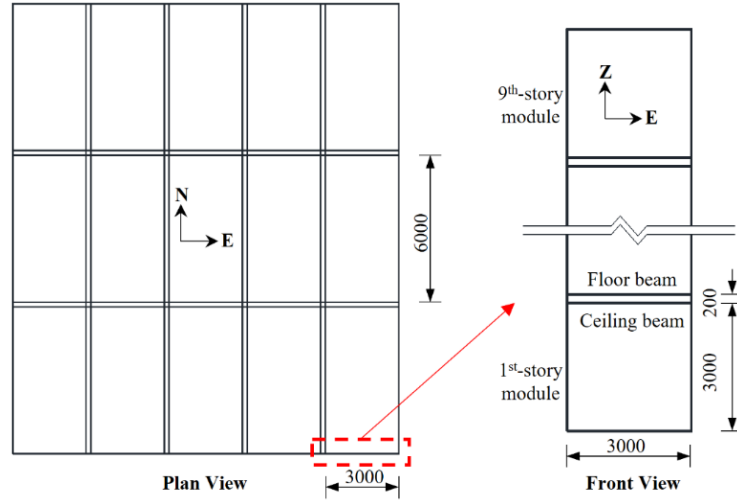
Dimensions of the 9-story prototype building with repetitive module layout and the frame of one stack of modules
